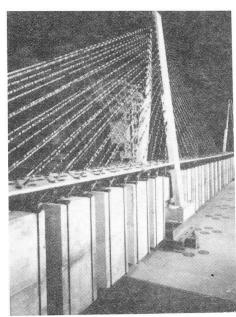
Large model test for cablestayed bridges with slender concrete decks
